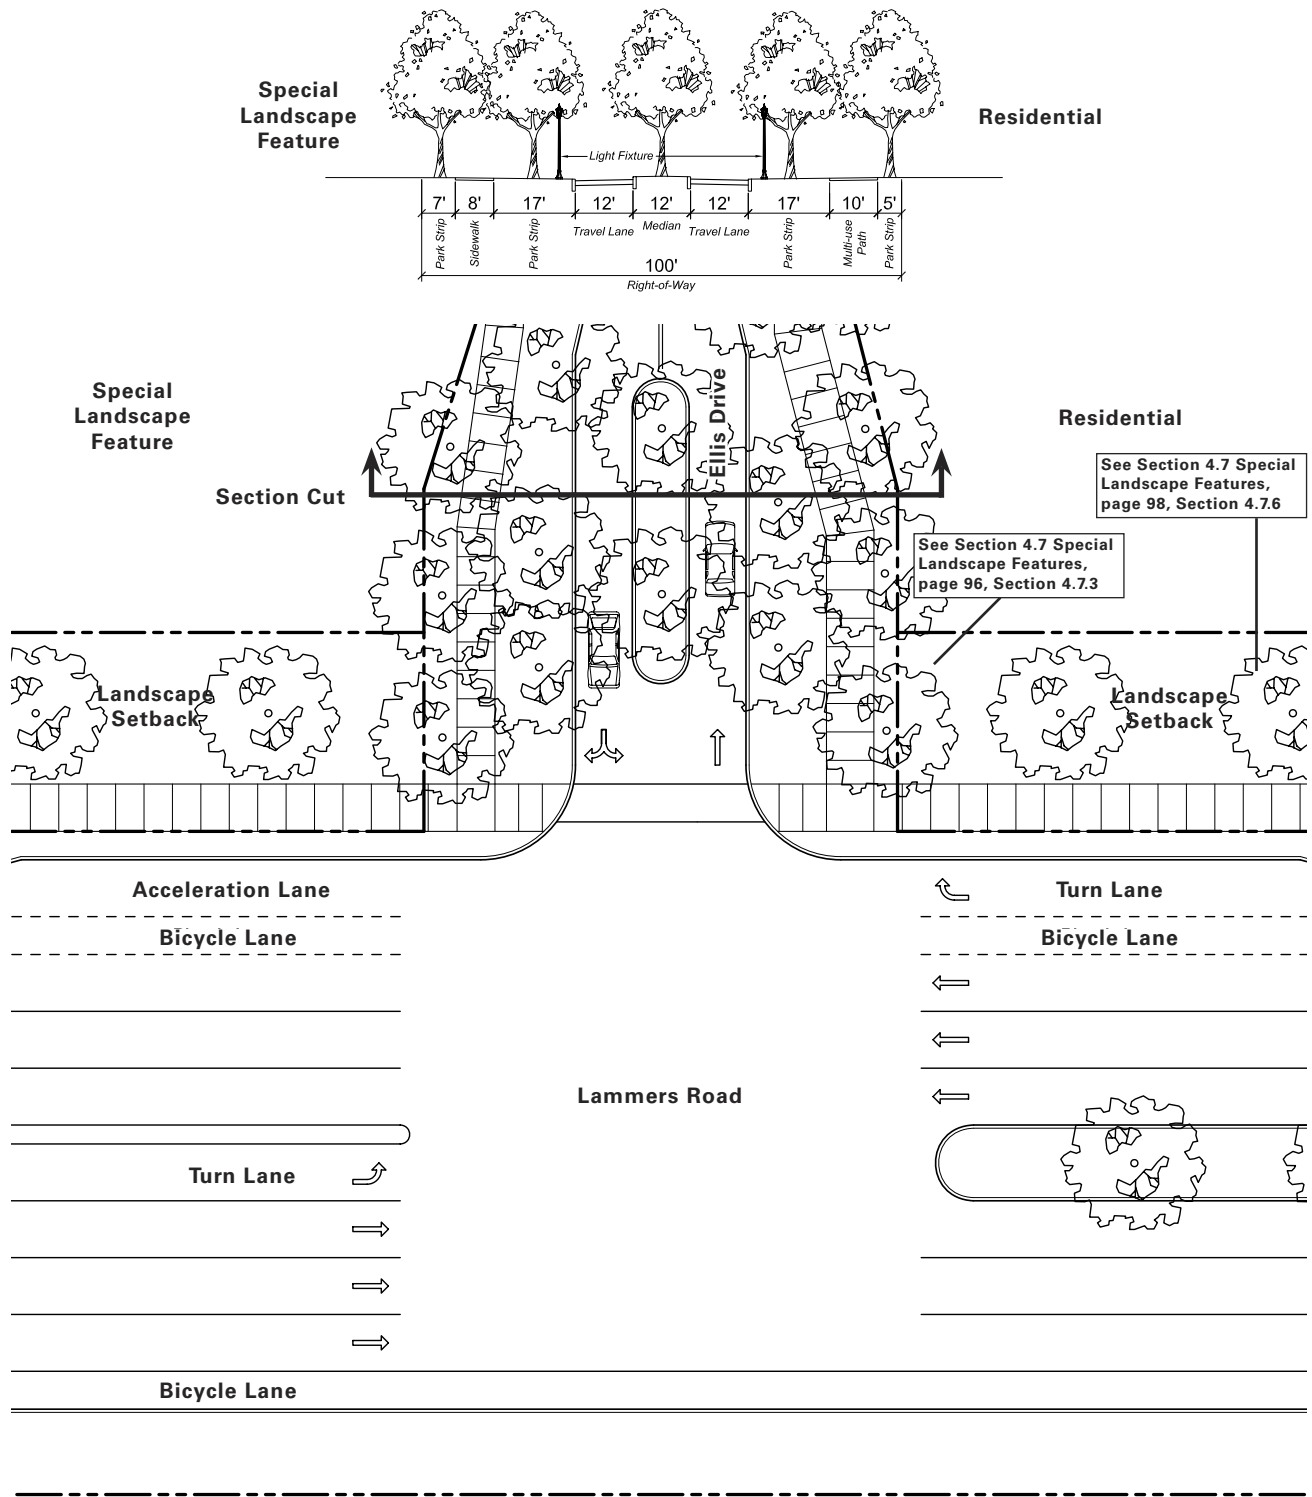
Proposed Section and Plan: Entry Street A
